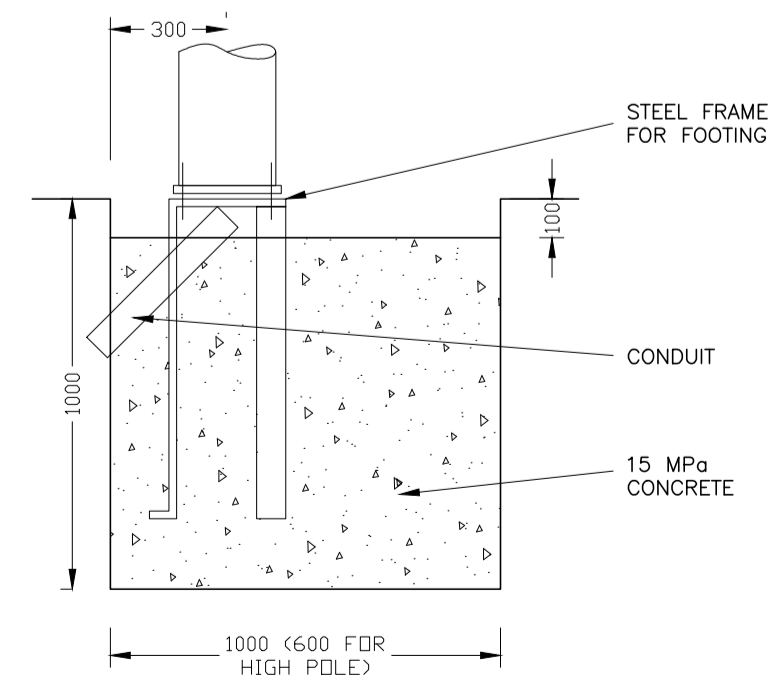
J: PLAN FOR FOOTING OF CONTROLLER BOX
